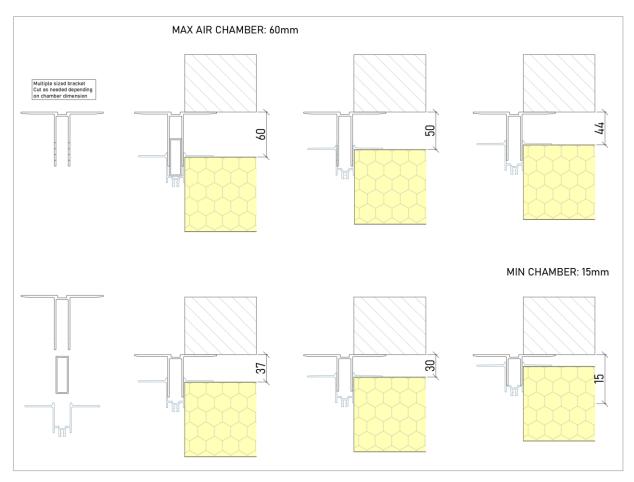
Vertical connection adapted to the size of the chamber [drawing created using AutoCAD]
